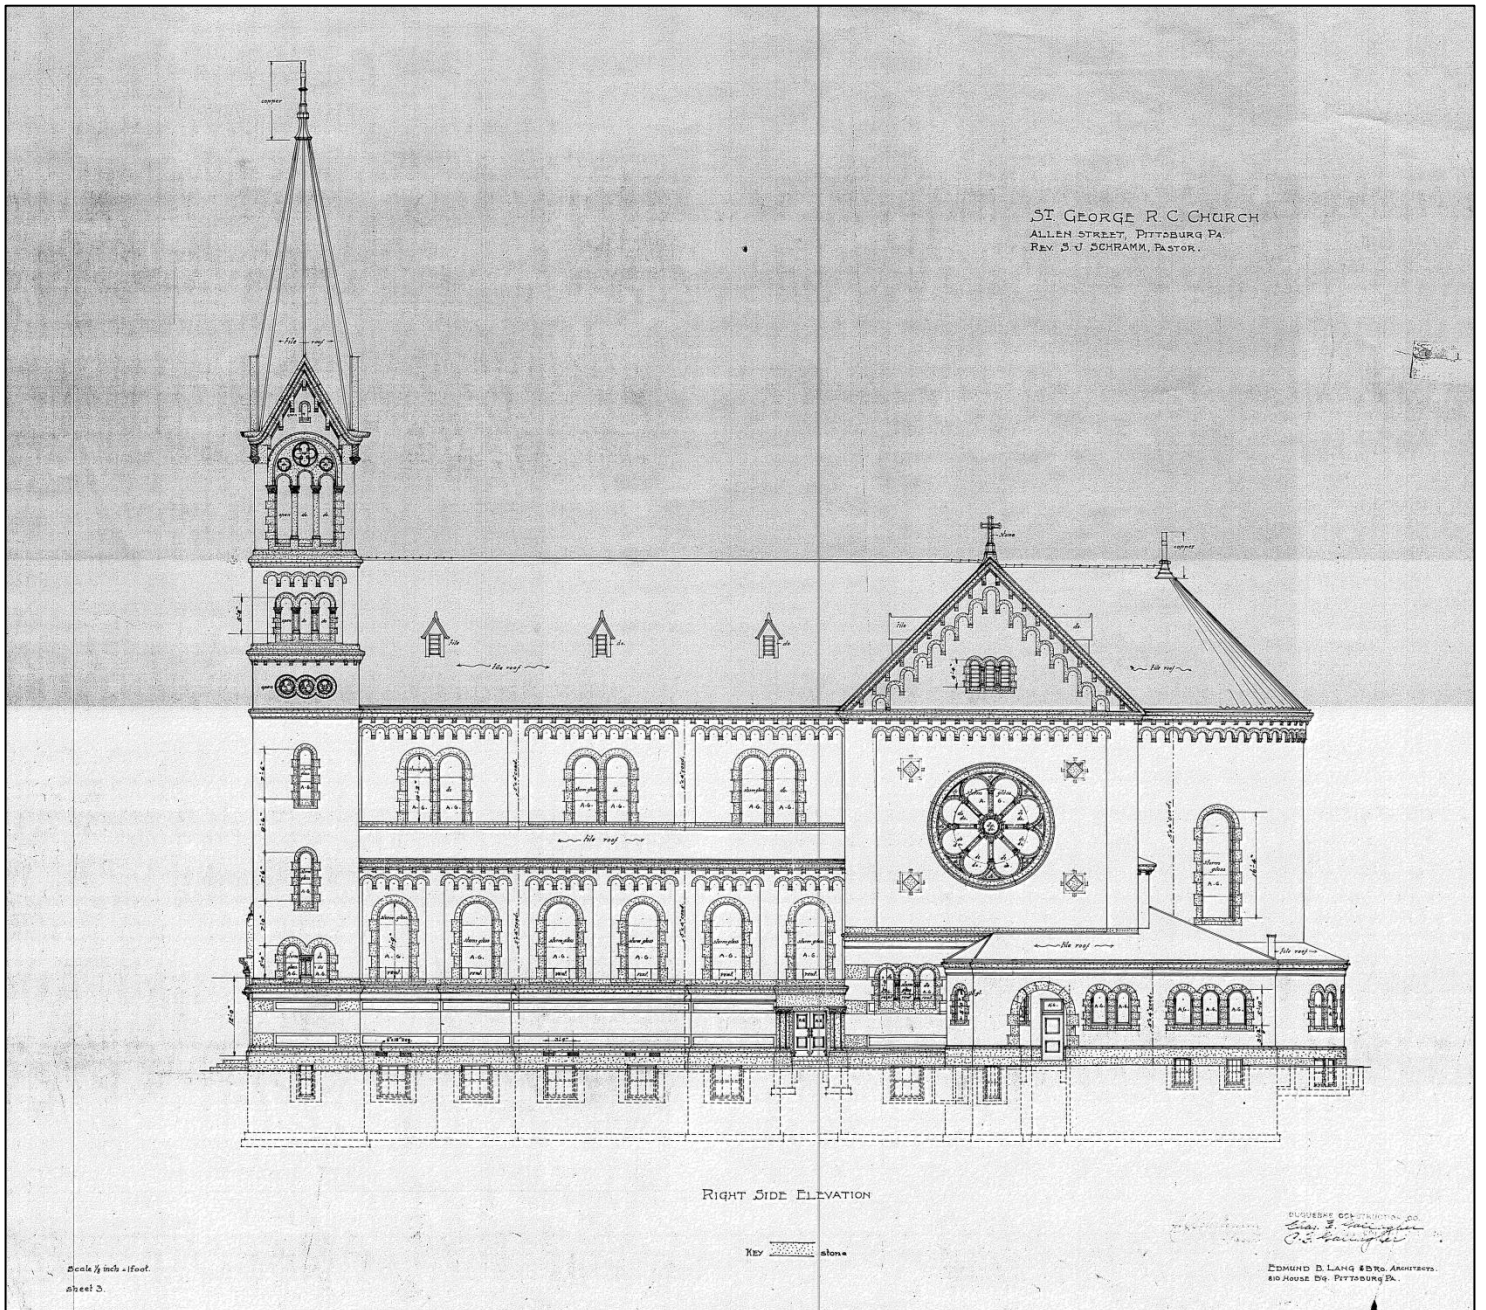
823 Climax Street, Architectural Rendering, Southern Elevation, 1910
